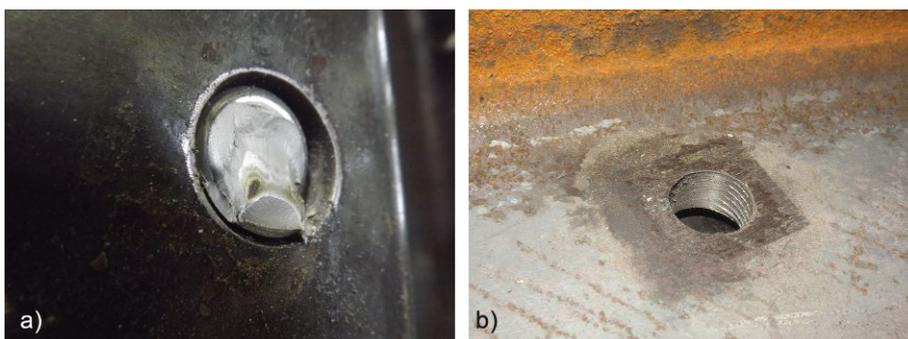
Typical mode of failures: a) bolt after fracture, no bearing deformation in the angle plate, b) thread penetration in the beam flange
